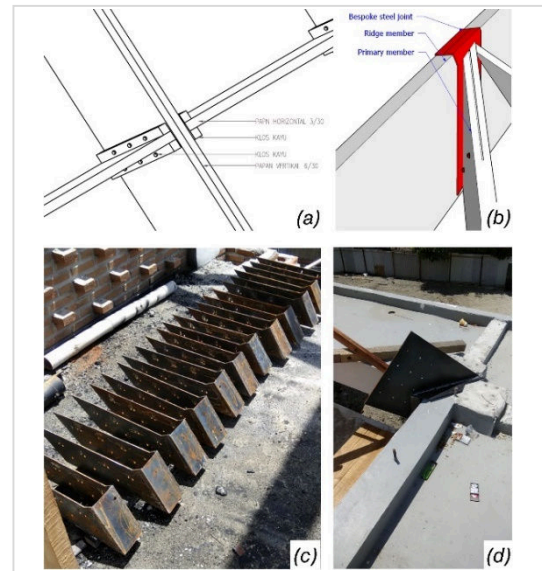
Connection detail: wooden shear block (a), ridge to primary member (b), primary member lower end (c) steel joints, and steel plates and bars on concrete ring beam (d)
